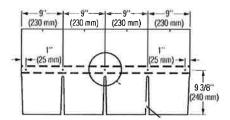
Fastening Hatteras Shingles on Low and Standard Slopes
